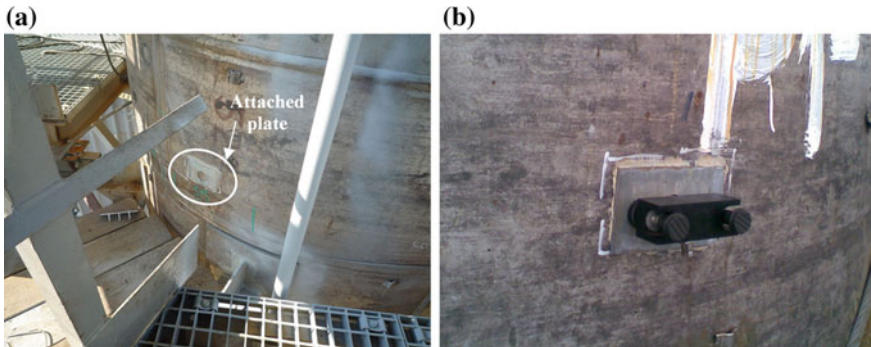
Method of sensors installation on the column non-magnetic surface: a magnetic metal plate with a hole for sensor is glued to the non-magnetic shell; b sensor is mounted on the plate using a standard magnetic holder
